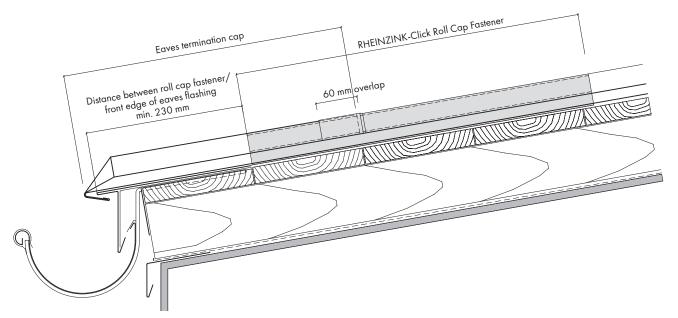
Eaves with positioning of roll cap fastener and overlap area of roll caps
